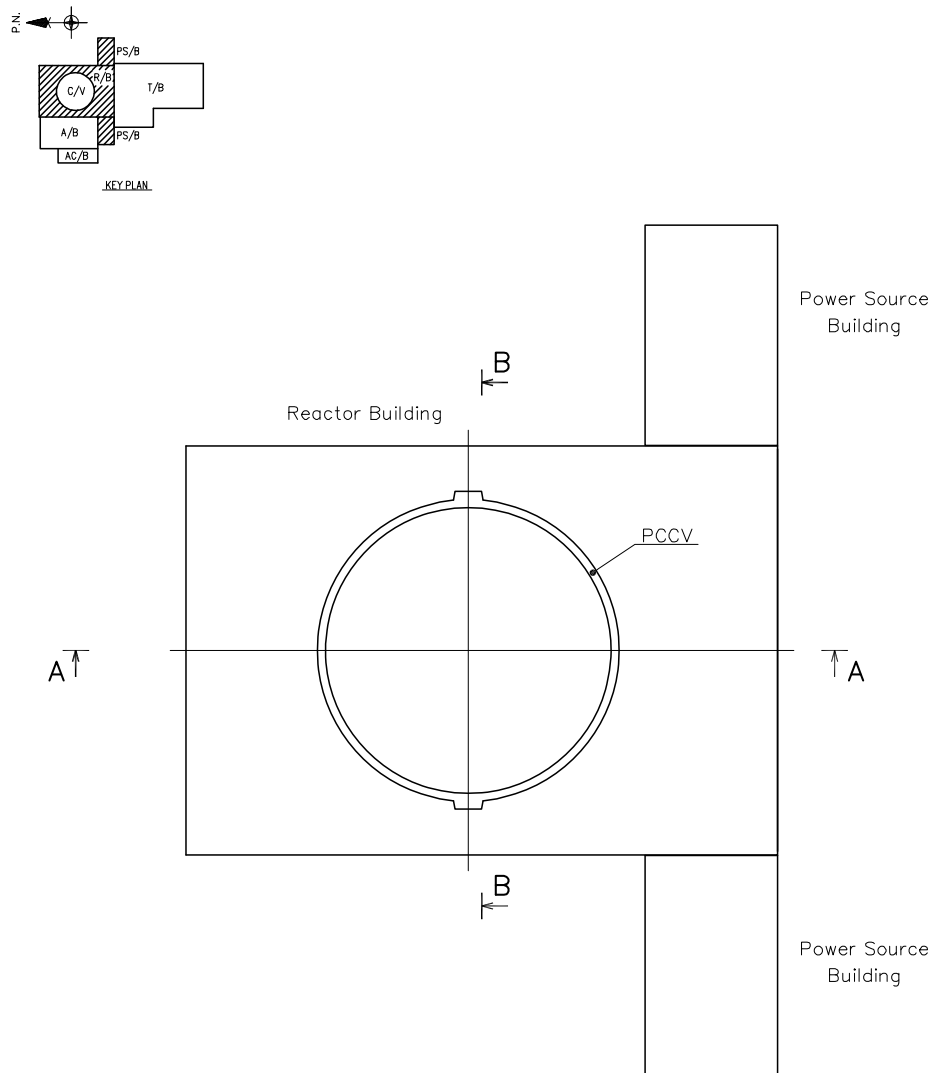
US-APWR Building Configuration (Plan View)
